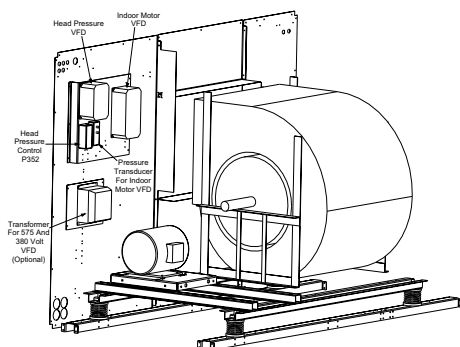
MOUNTING LOCATION OF HEAD PRESSURE CONTROL
